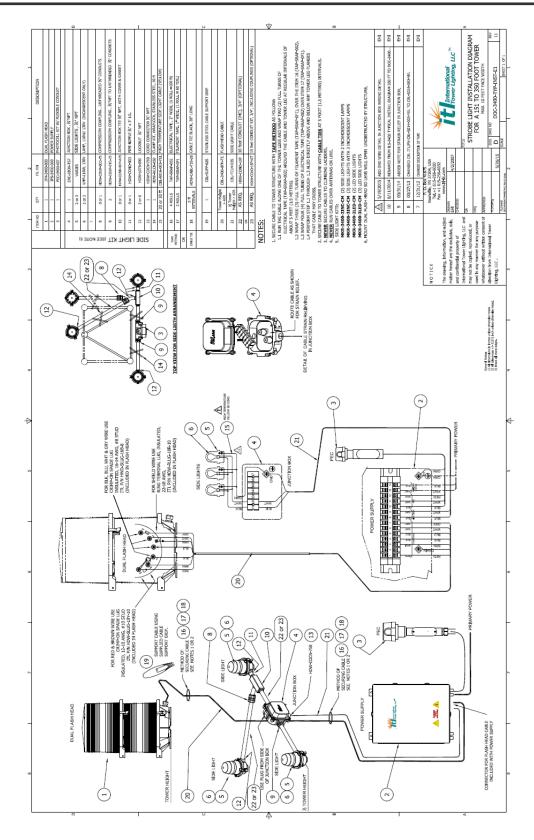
ILS-3400 Single System Typical Installation Diagram – 350'
